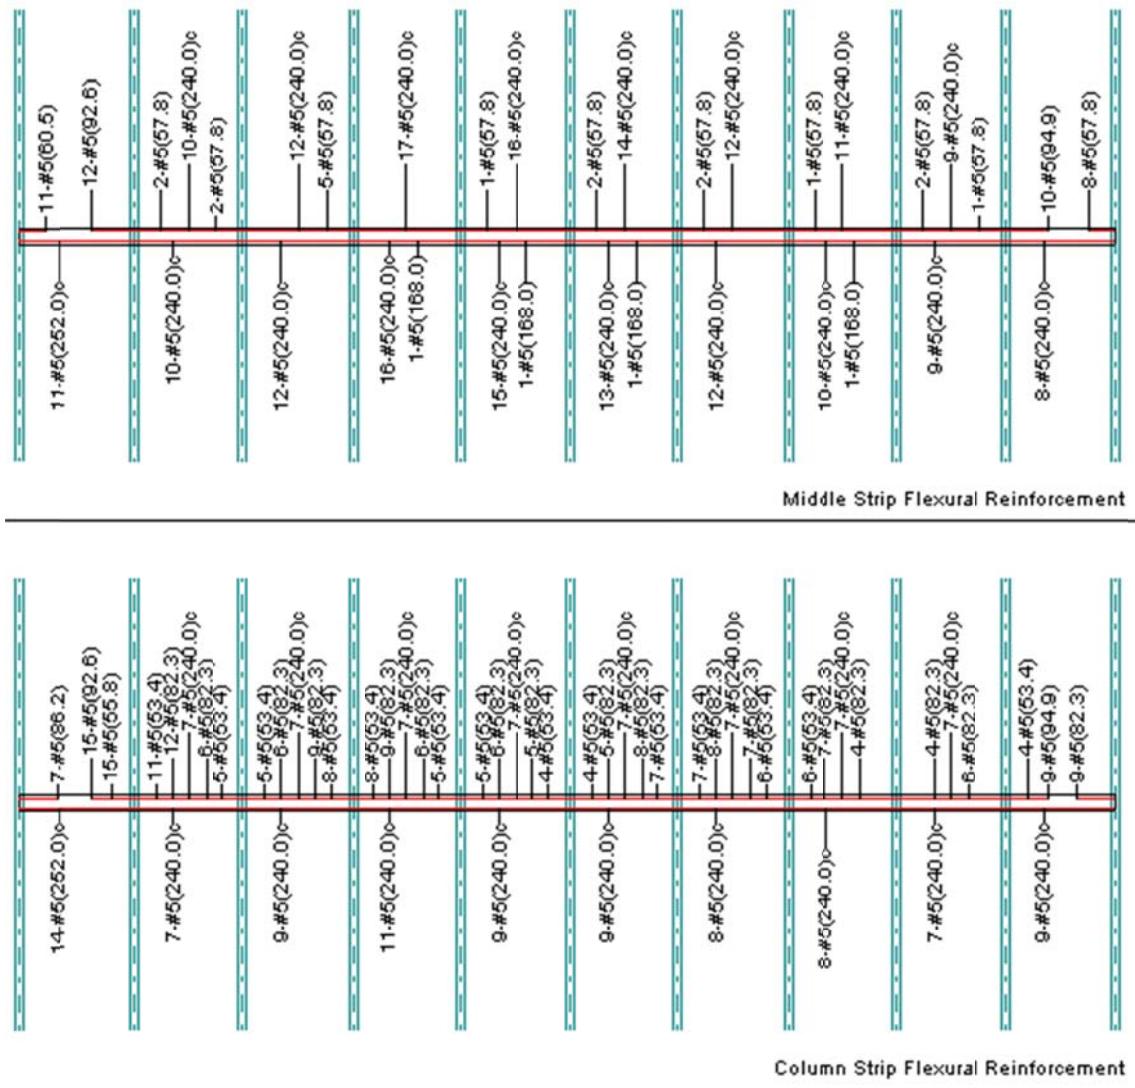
spSlab Column Line 7 Reinforcing Diagram
